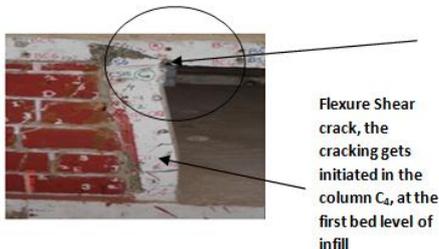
(e): Flexure shear crack in column C4, crack in C4-B1-B5 Joint and spalling of CONCRETE
